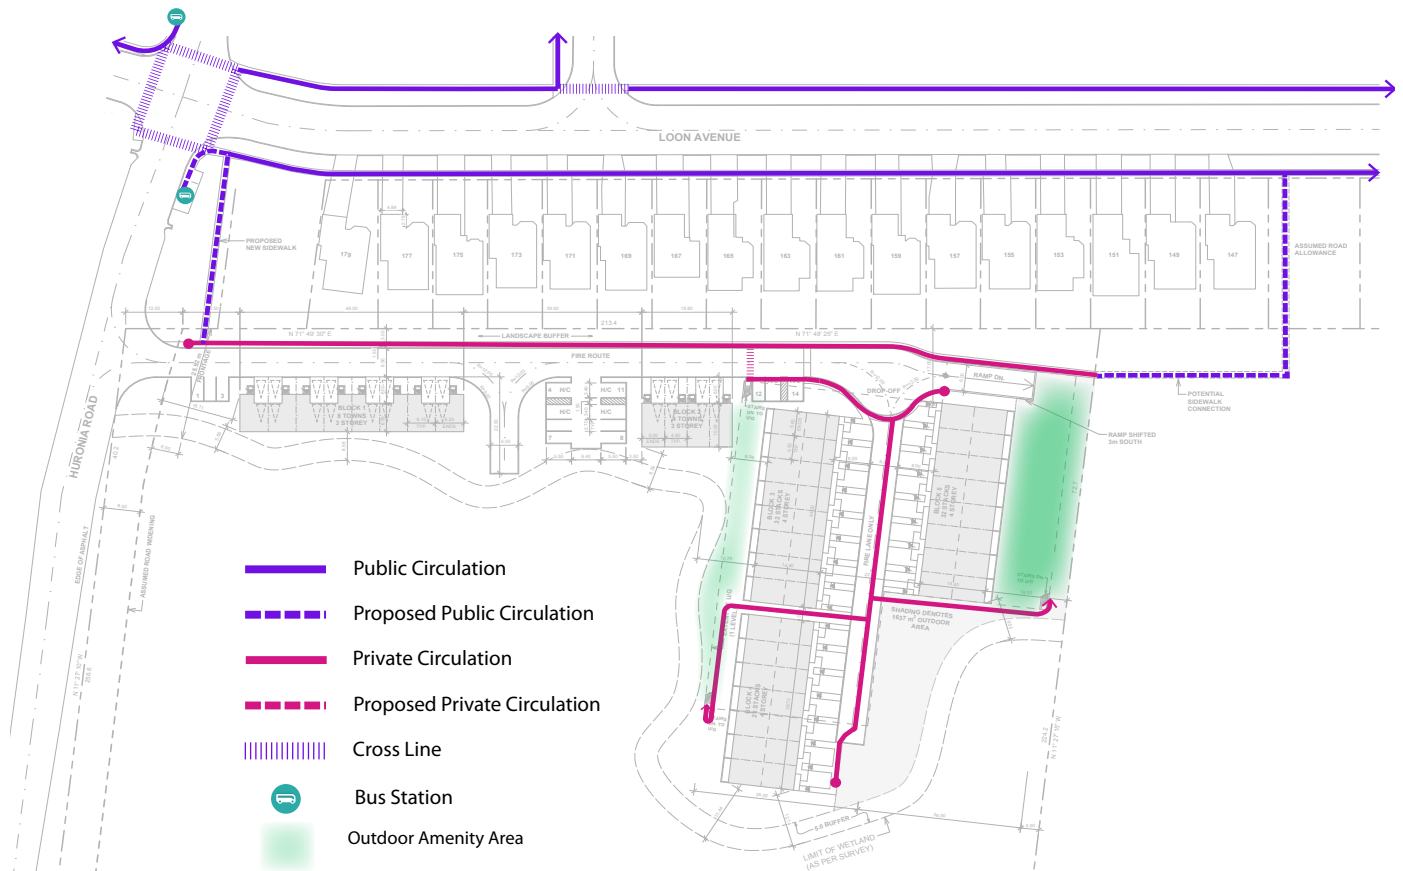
Proposed pedestrian circulation diagram on Site plan.
